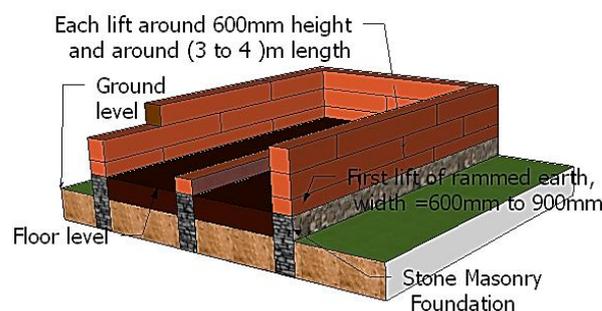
Construction configuration of rammed earth Walls and Foundation.
